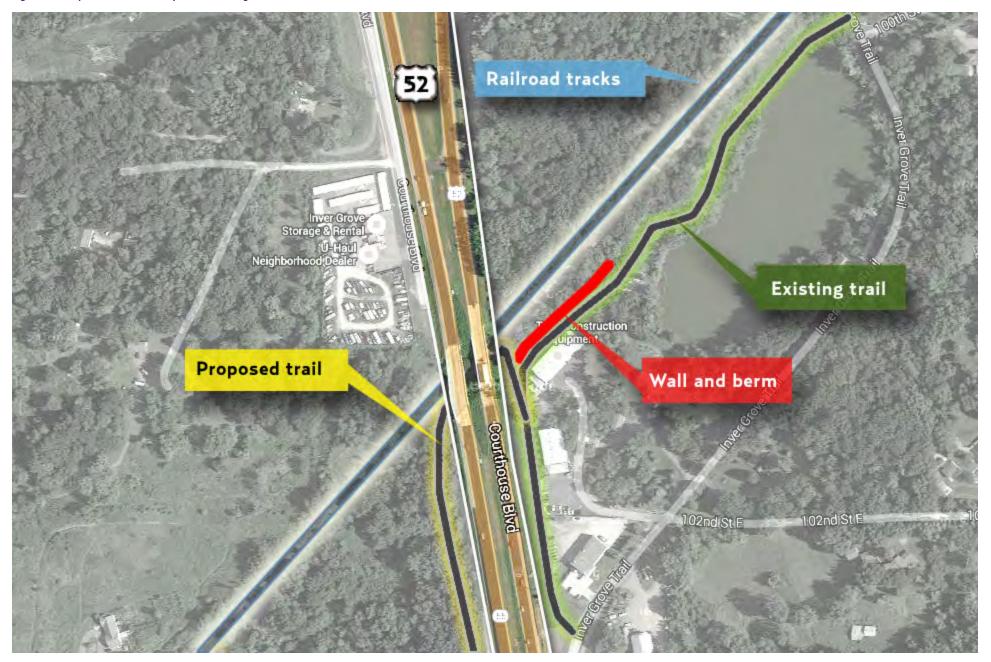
Hwy 52 Railroad Underpass Detail Diagram
